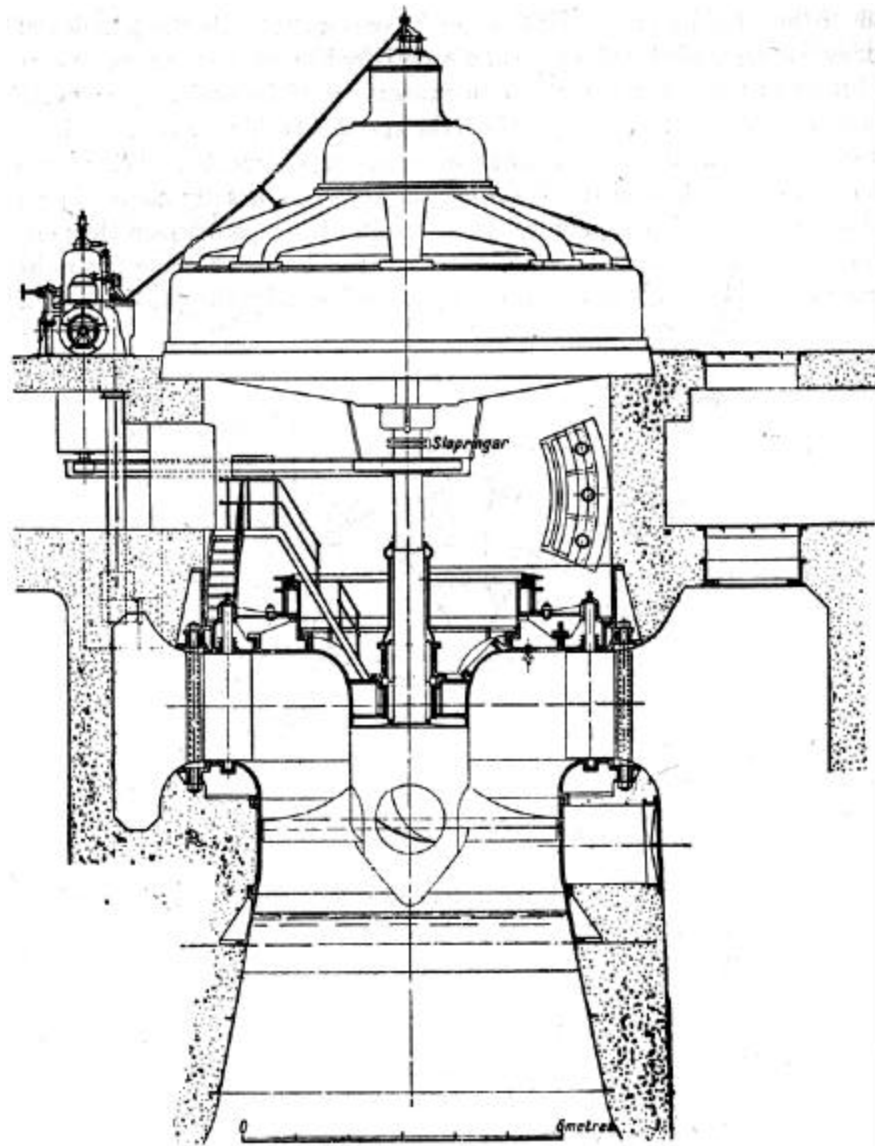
Section of Kaplan Turbine Runner, diameter 19.0 ft. 11,200 H.P. under 21.3 ft. head.
